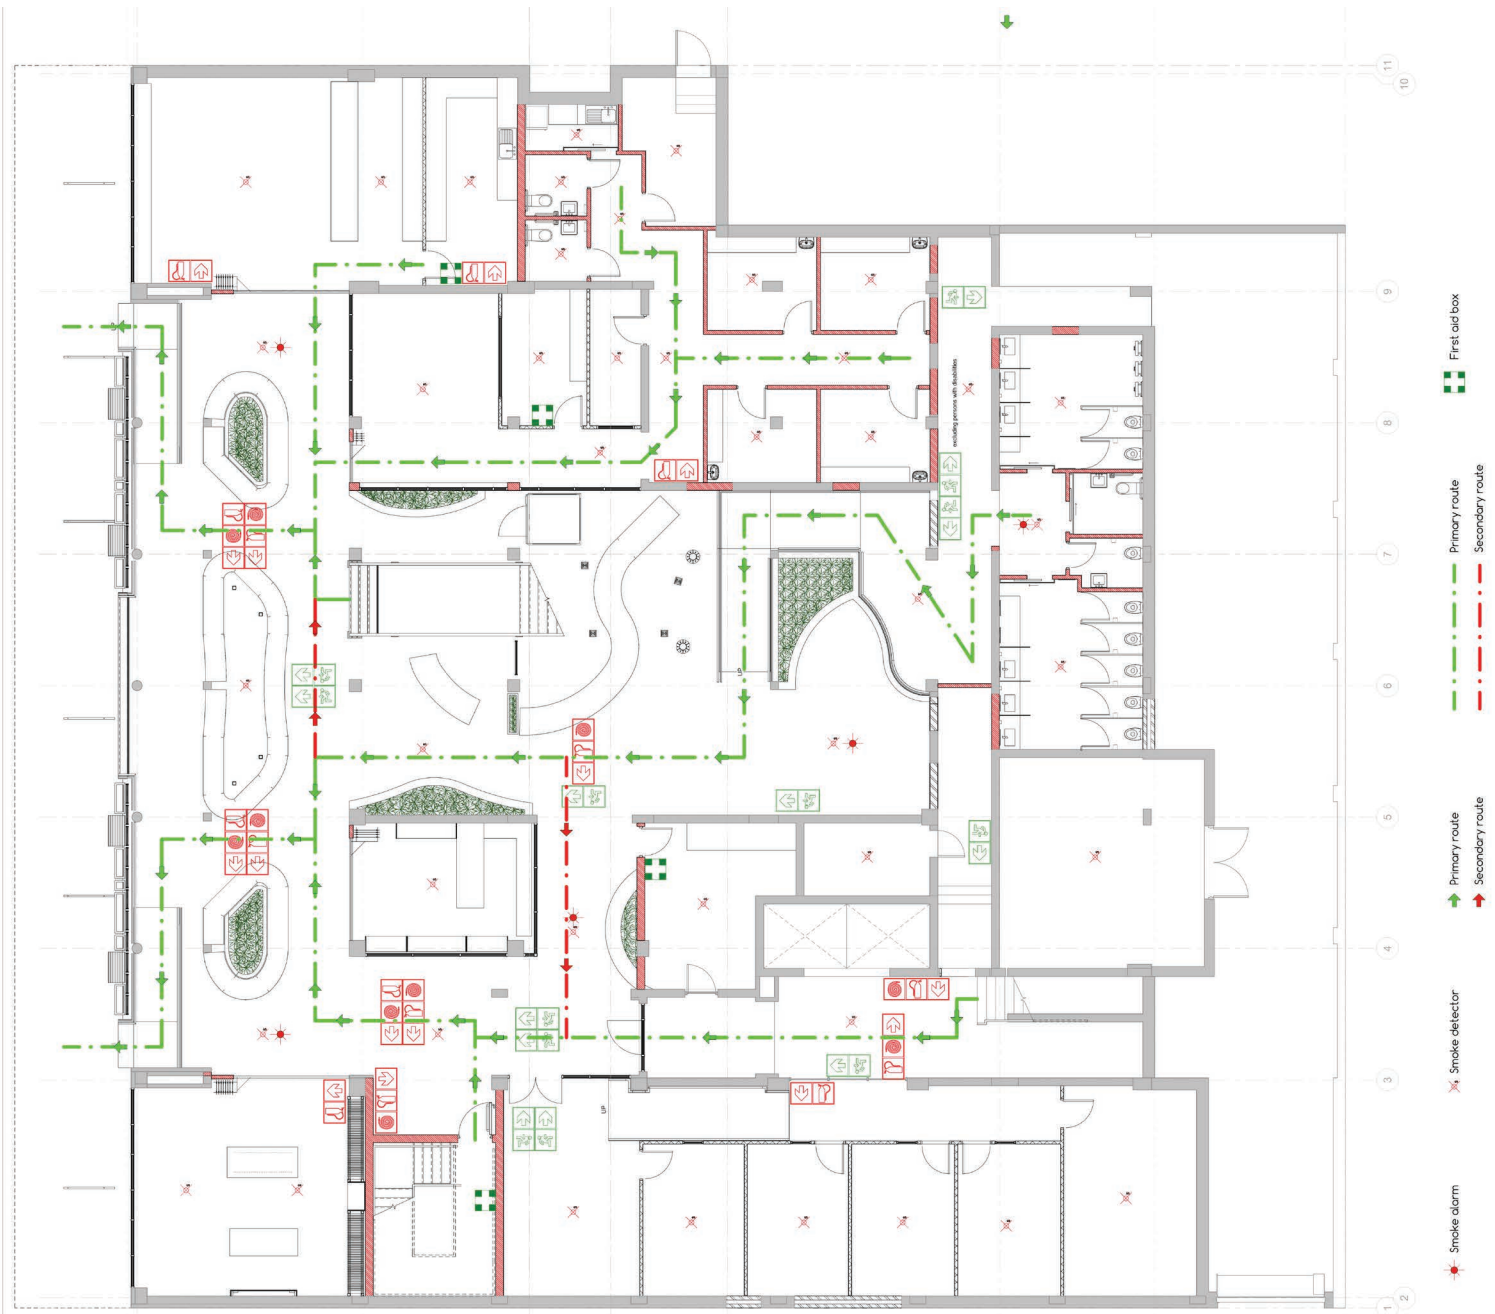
Propose fire services and evacuation layout plan (NTS)
